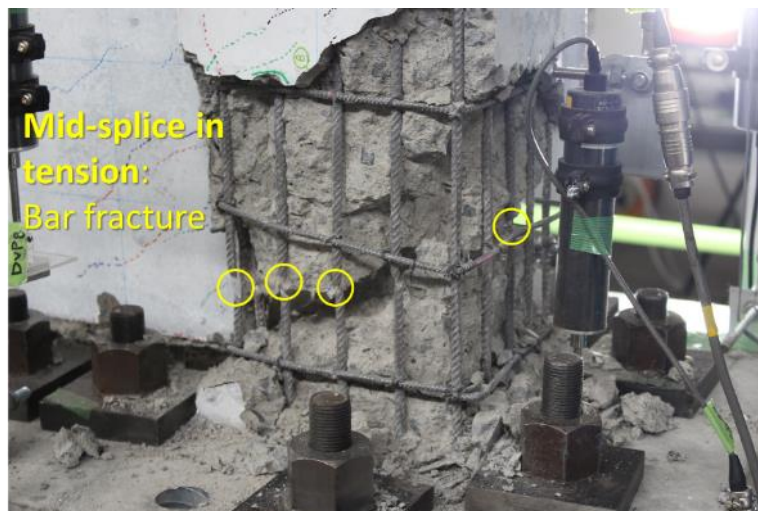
Negative loading of Wall A, which led to fracture of vertical bars.
